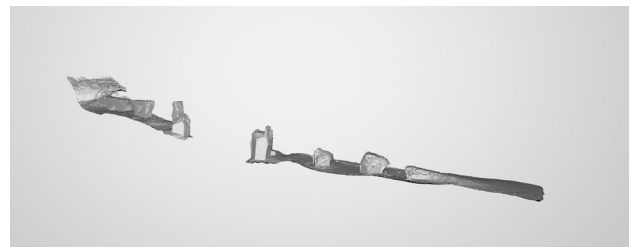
View 2 of the bridge current condition (remain of the bridge) (source: AutoCAD 2023)
